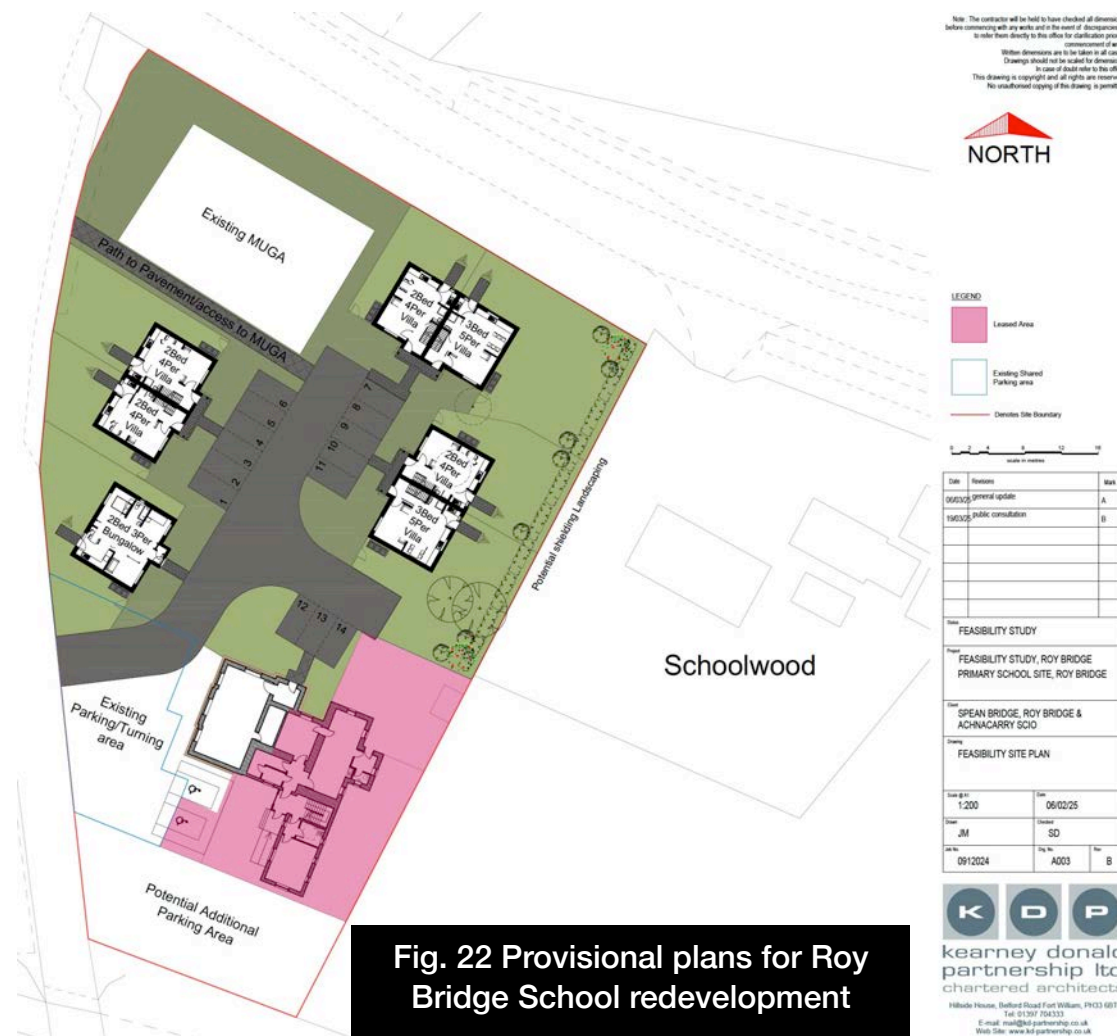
Provisional plans for Roy Bridge School redevelopment
